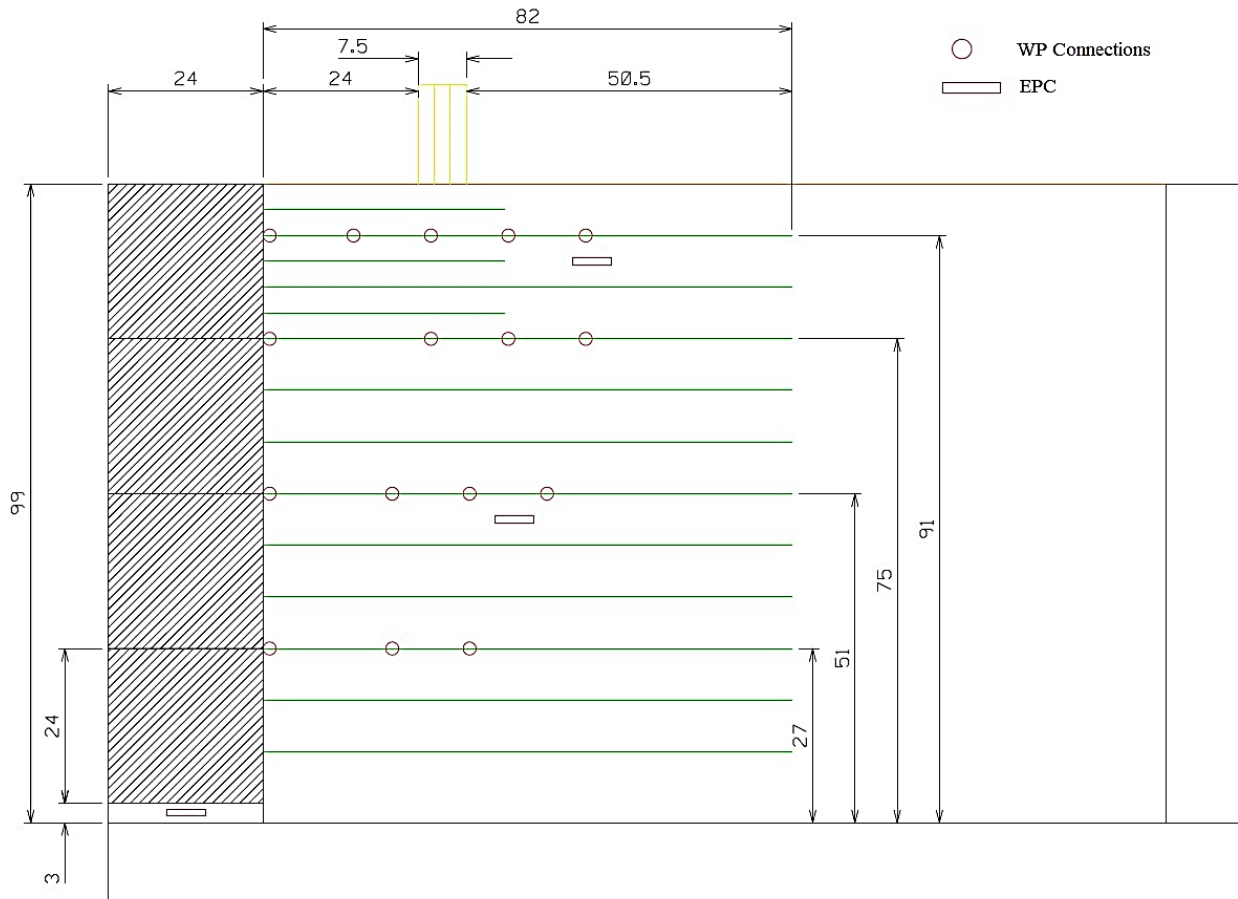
Schematic instrumentation layout for GRS Abutment Model #2 (Large concrete block facing with 8-inch reinforcement spacing; Dimensions are in inches)
